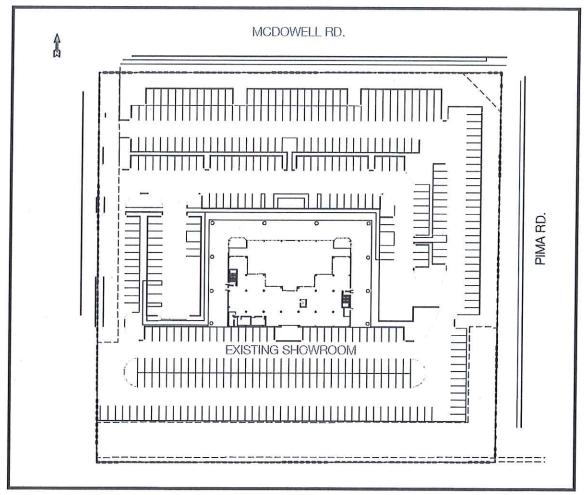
Existing Building and Parking at 8705 East McDowell Road
